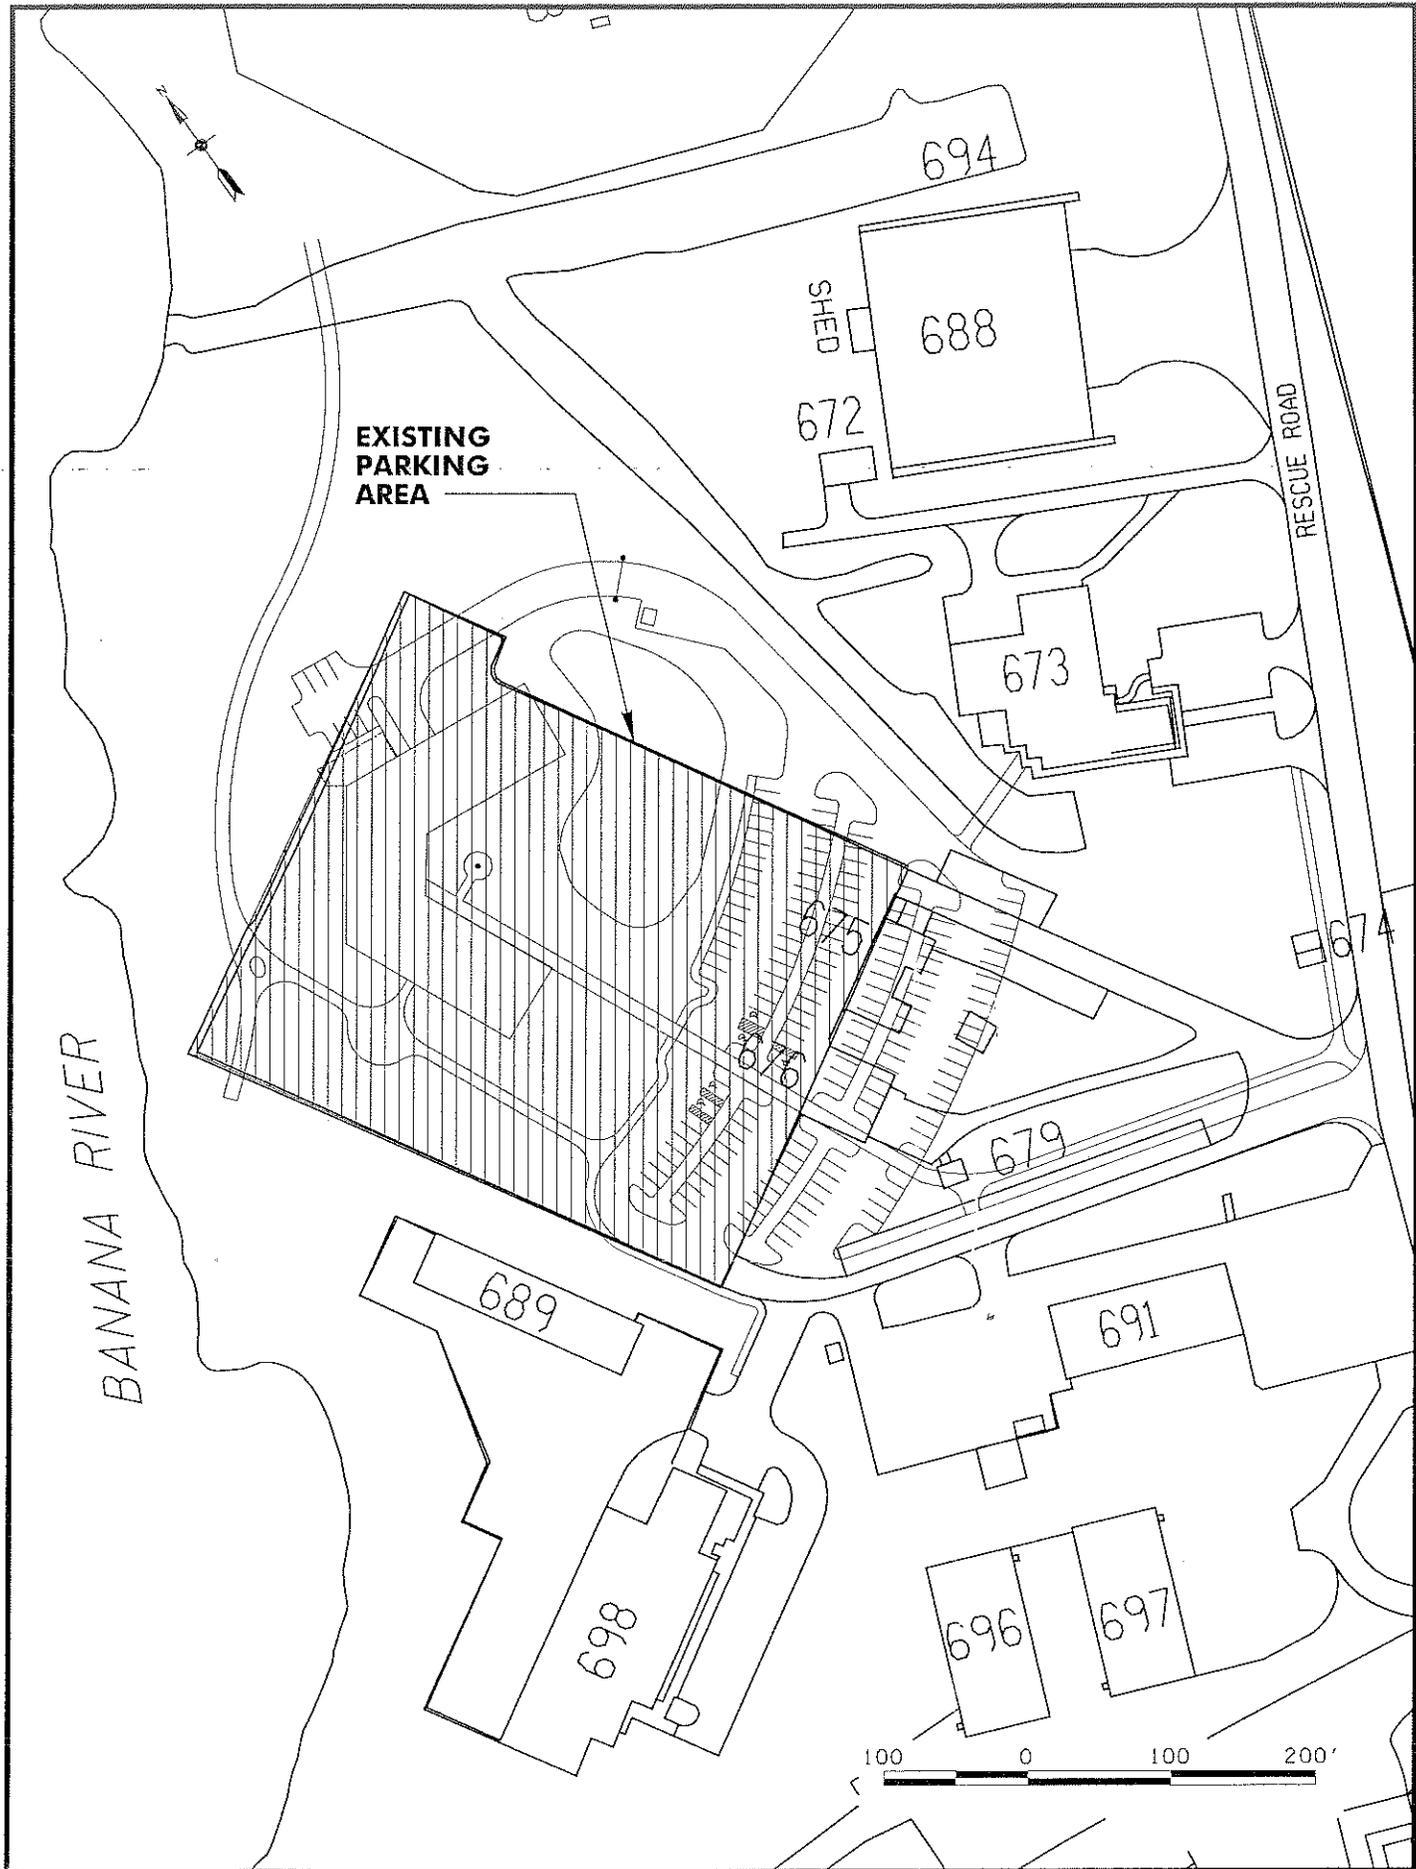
EXISTING / PROPOSED WING HEADQUARTERS SITE PLAN
